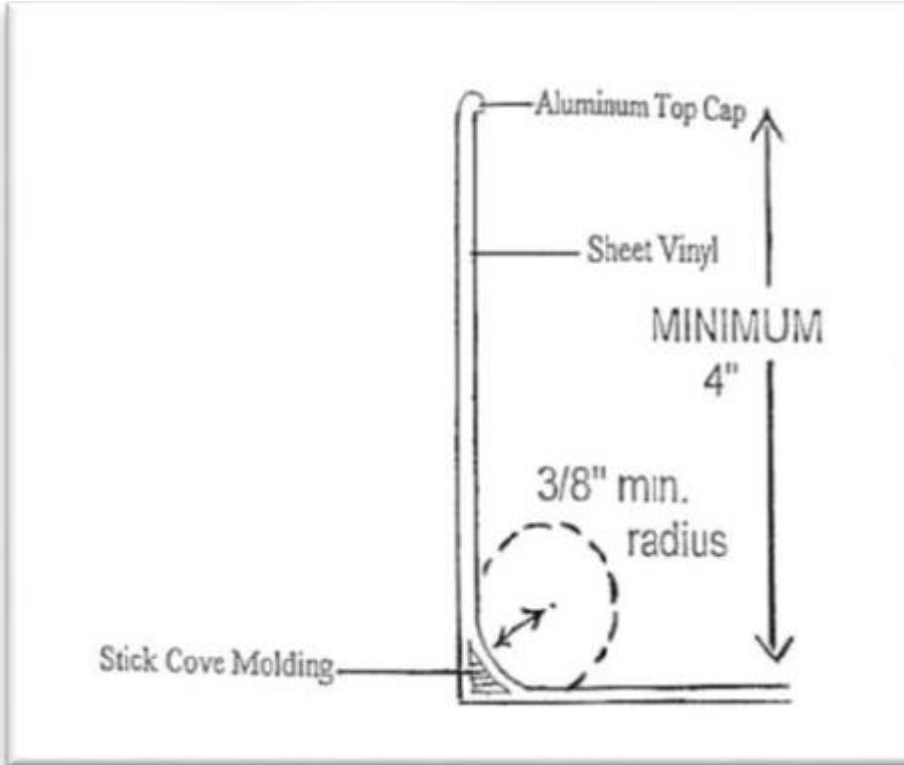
Commercial Sheet Vinyl Installation (*Not approved in cooking areas or areas subject to high moisture*)
